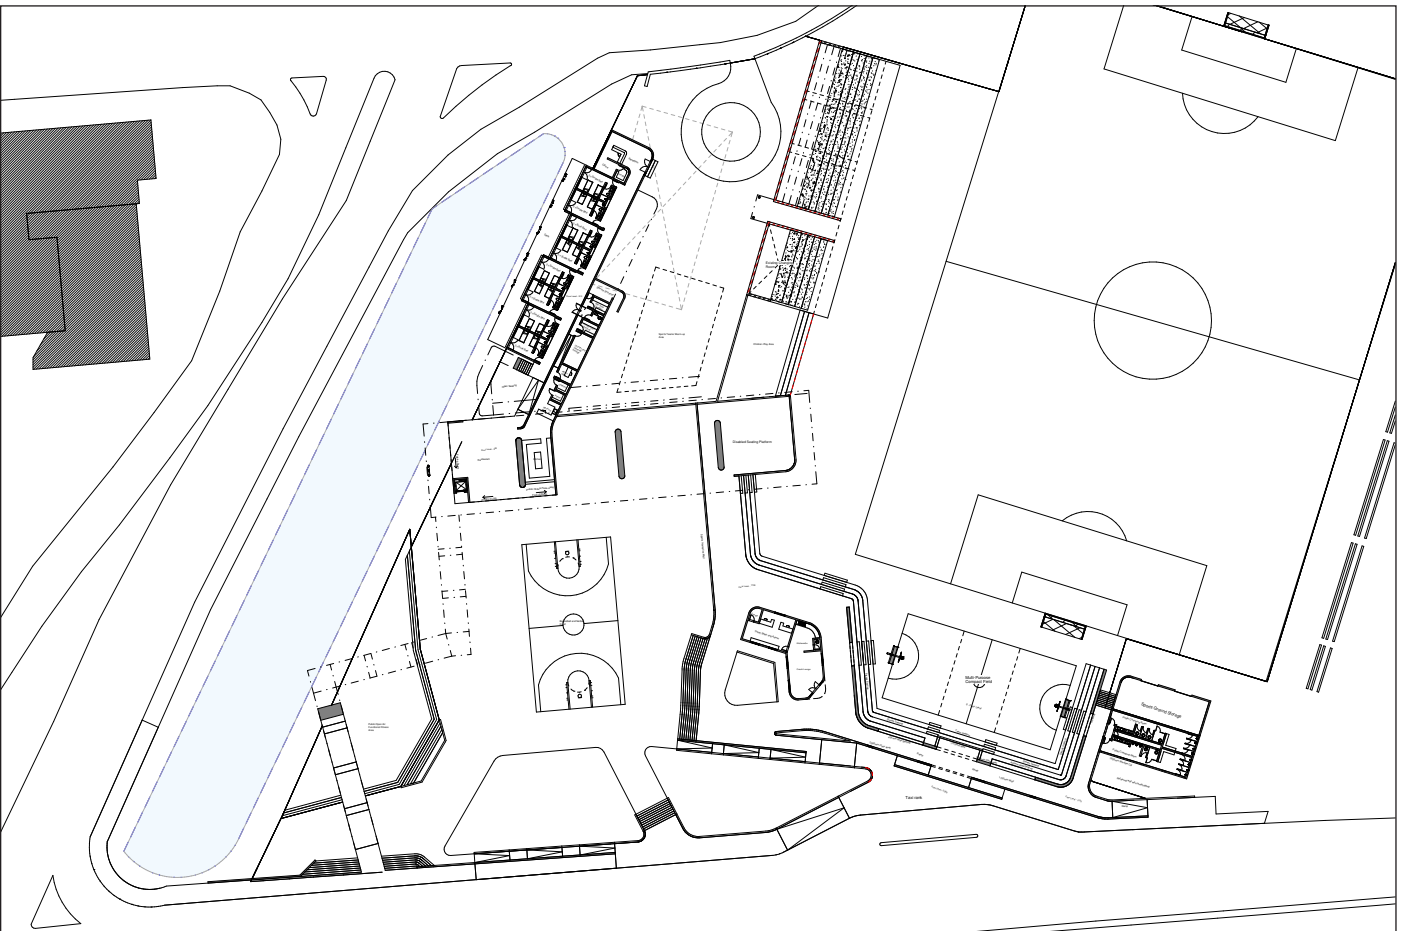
Iteration 2 ground floor plan (Author: 2019)
